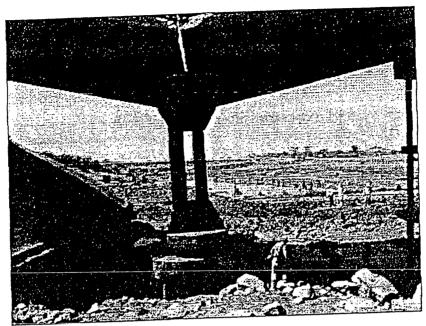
Collapsed No.24 Bridge Middle spans of Steel Piles collapsed
